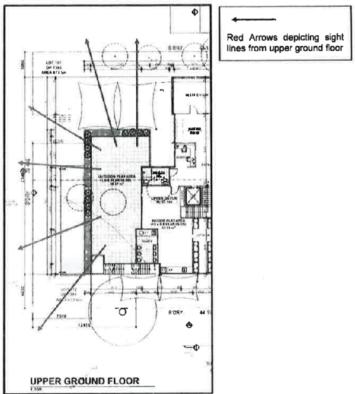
Snippet of upper ground floor plan demonstrating potential impact upon adjoining private open spaces.
